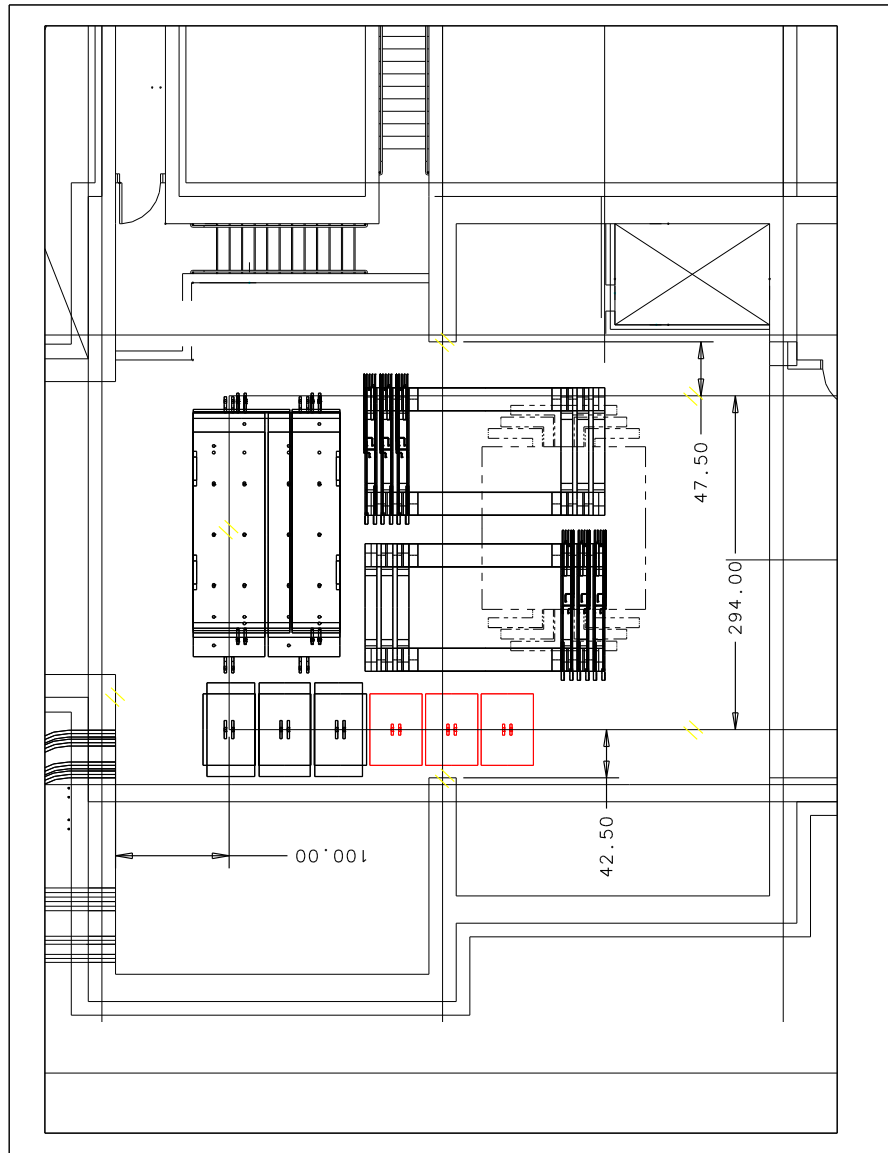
Plan for Storing Pieces of SM3 in C0 Assembly Area Prior to and in Preparation for Reassembly of the Magnet
